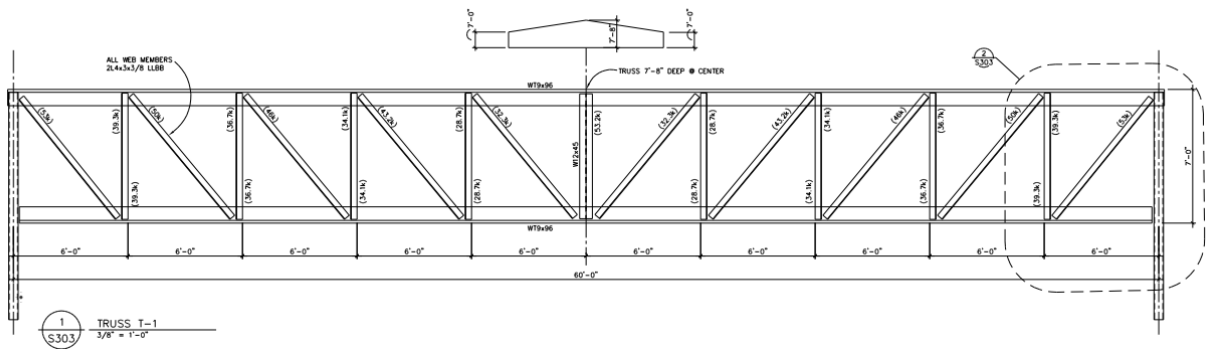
Truss T-1 Profile for Prince Conference Center Roof 1.
